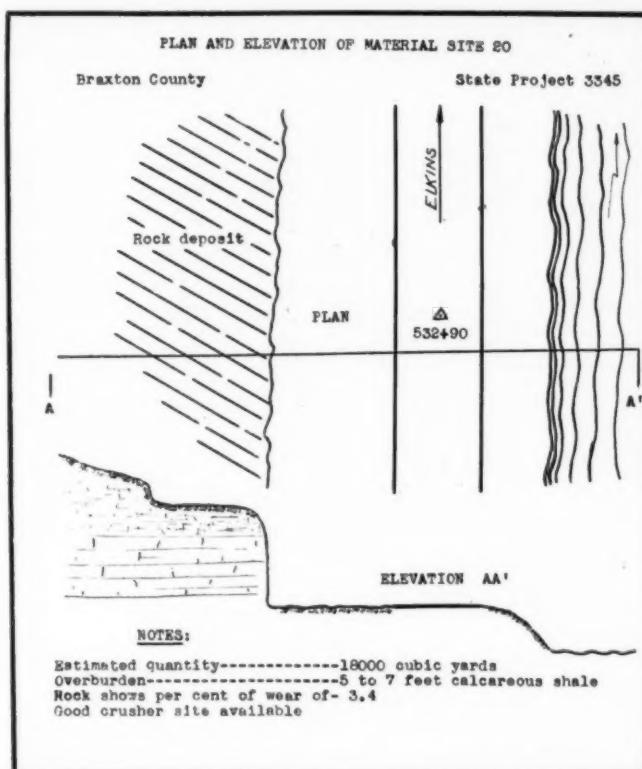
Plan and Elevation of Proposed Quarry Site.
